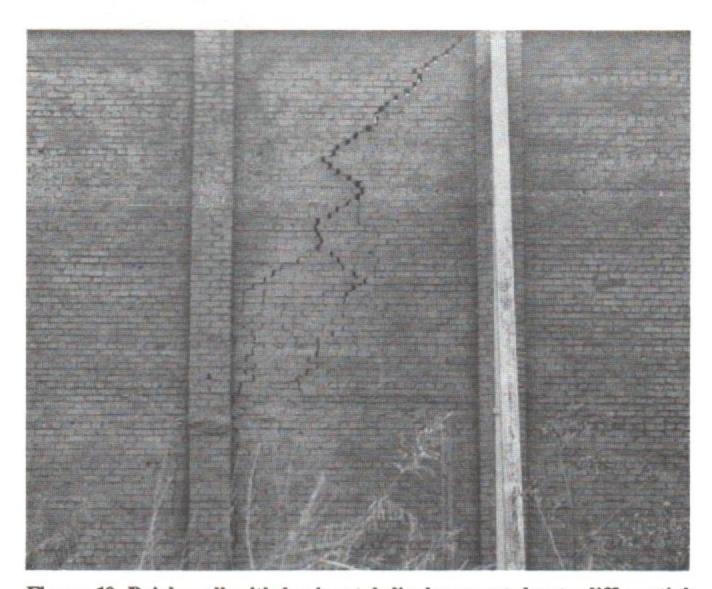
Brick wall with horizontal displacement due to differential vertical movement of the soil.
